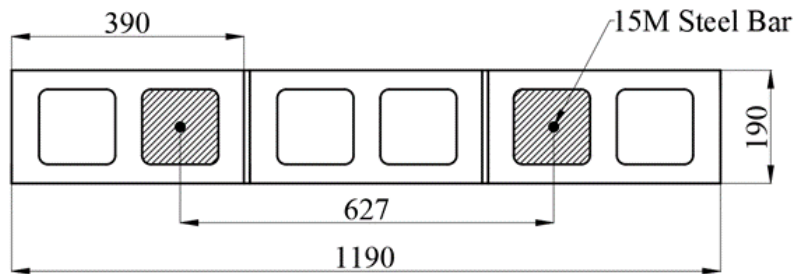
Specimen Cross-Section (Mohsin 2003)
